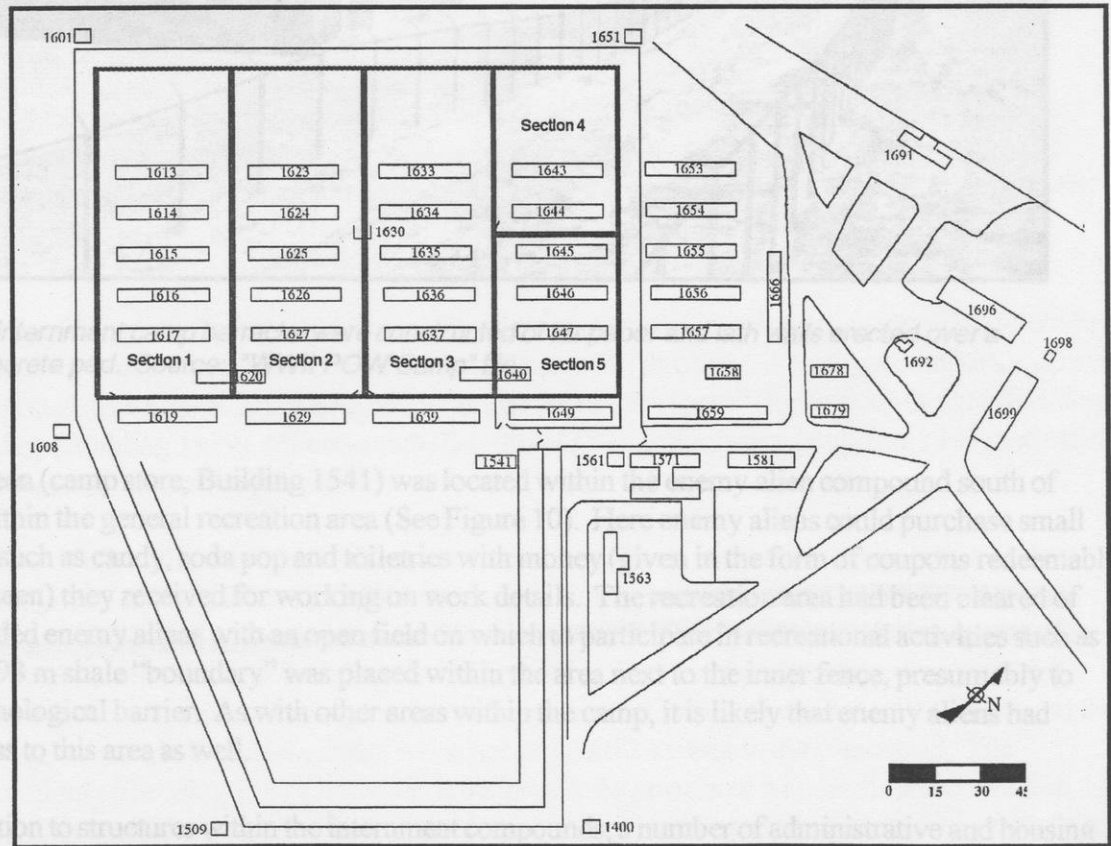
Location of guard towers at the enemy alien internment camp highlighted in red. Source: "Plot Plan of Detention Camp," 1942.
